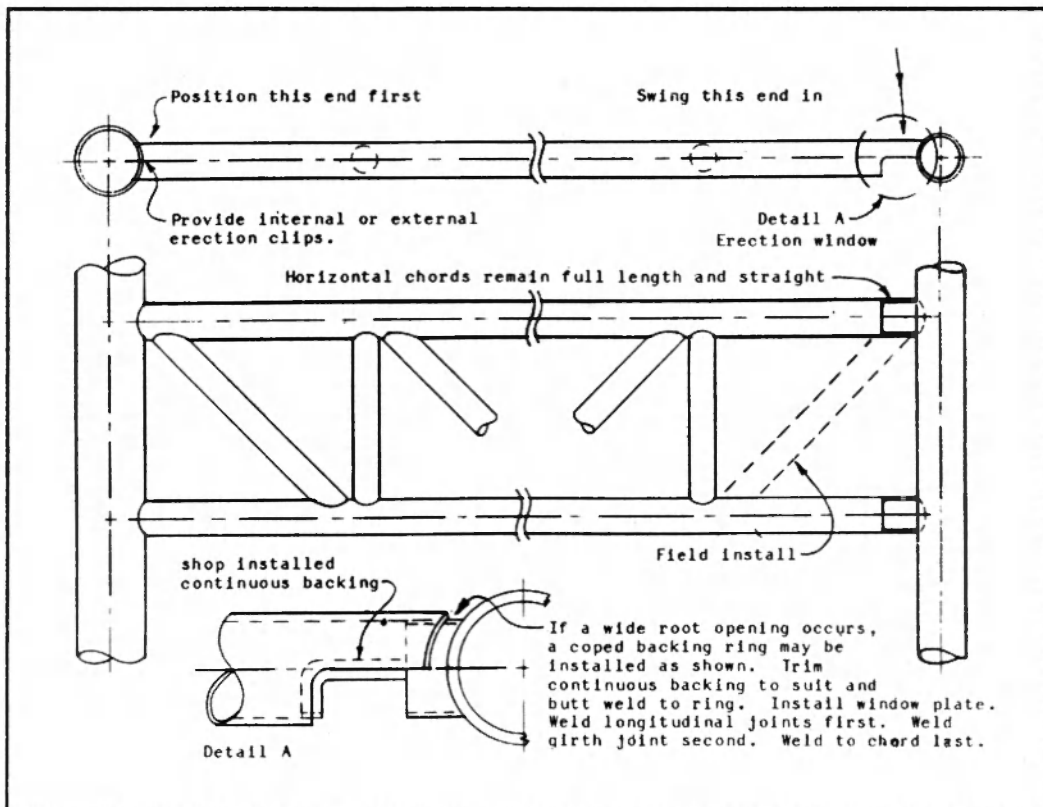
Field installation of an intermediate truss using erection "windows" in place of stubs.
